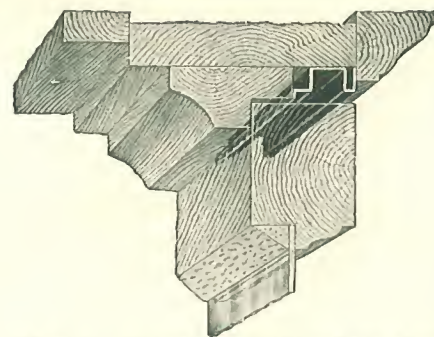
Cross-section through sash and window frame at top showing installation of "AiR-Way" track above sash and tight application of sash.
